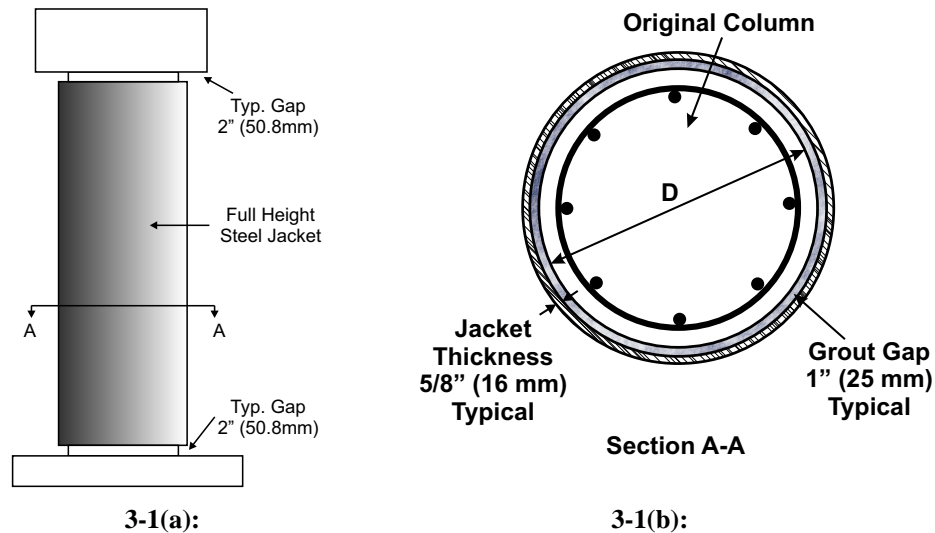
Typical steel jacket retrofit details: (a) full height, (b) typical section.
